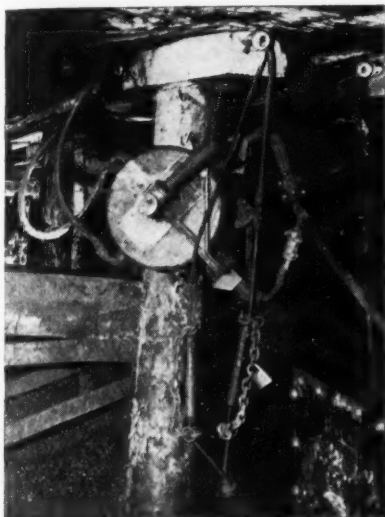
Miller connectors are padlocked in a manner similar to these, which hang near the fused gas-tight mining-machine junction box.
